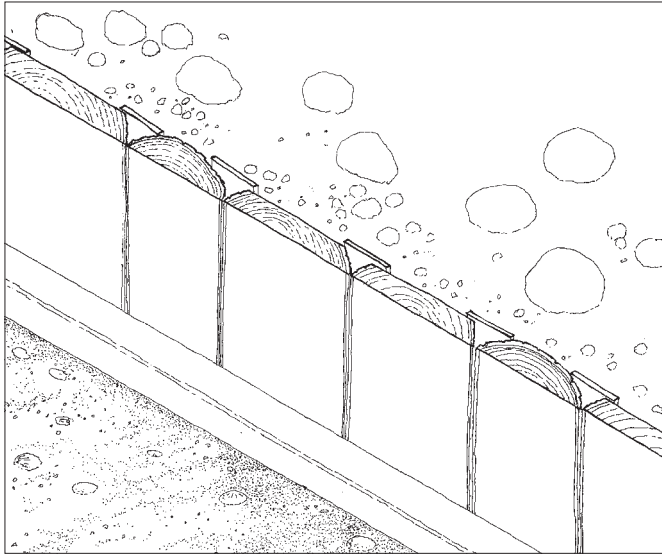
Miseno, formwork comprising untrimmed timber slab cut planks with vertical battens sealing the joints between boards (C. J. Brandon after Benini and Lanteri 2010: 114–15).
